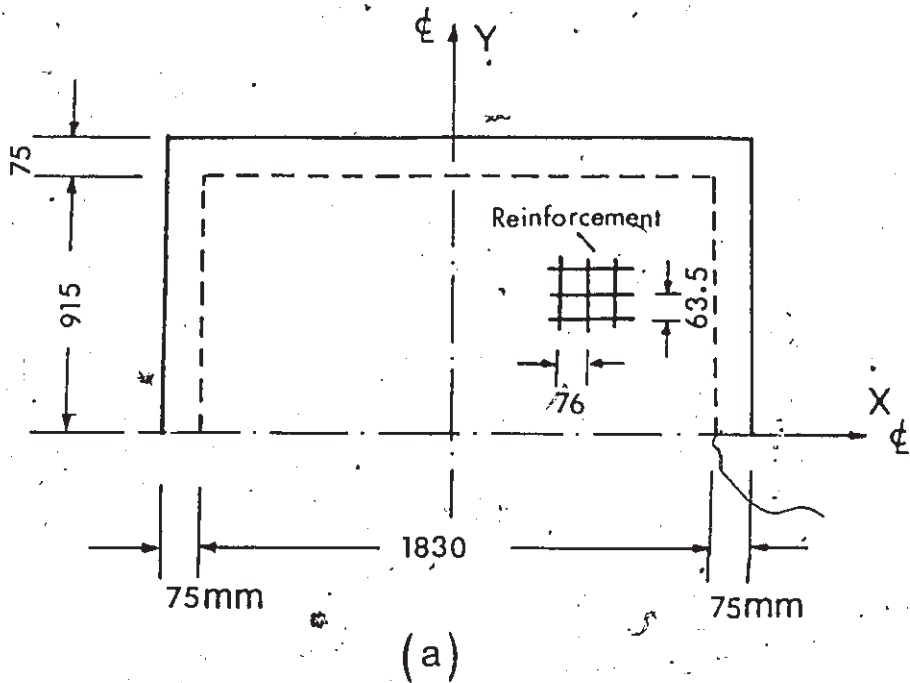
Geometry and Cross Section of a Simply Supported Reinforced Concrete Slab Tested by Taylor et al. [142].
